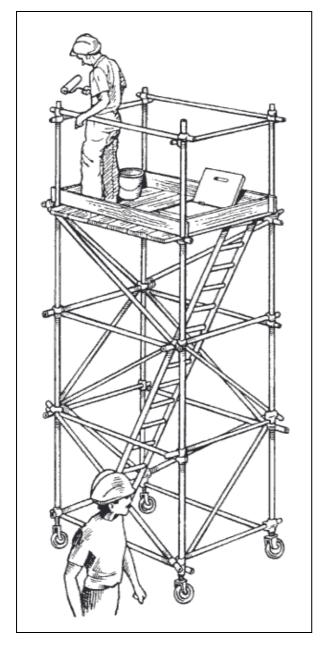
Mobile tower scaffold-wheels should be locked when in use; ladder access should be inside the tower
